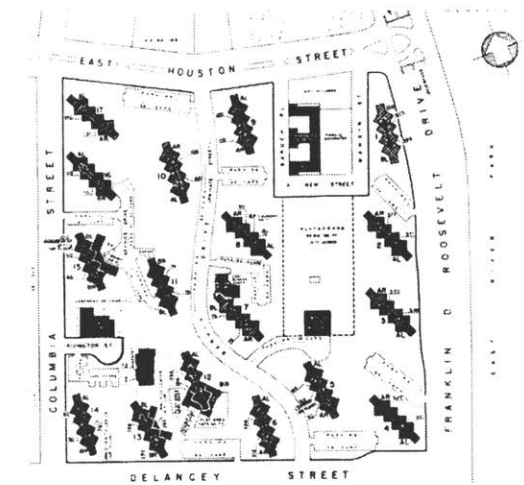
Arbitrary urban plan, Baruch Houses, New York City.
